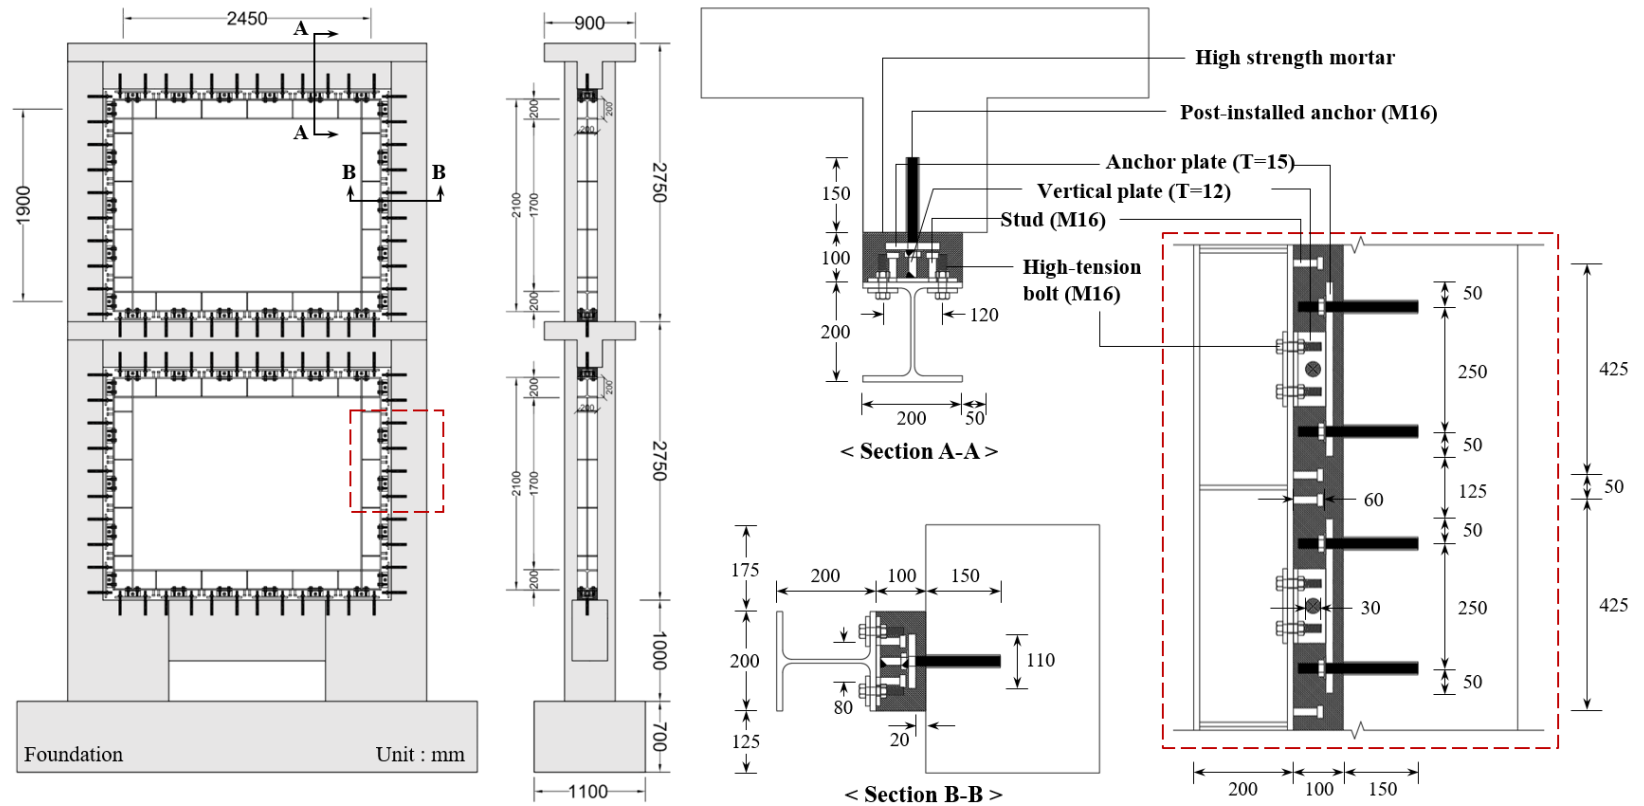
Dimensions and connection details of specimen retrofitted with internal steel moment frame (IN-2)
